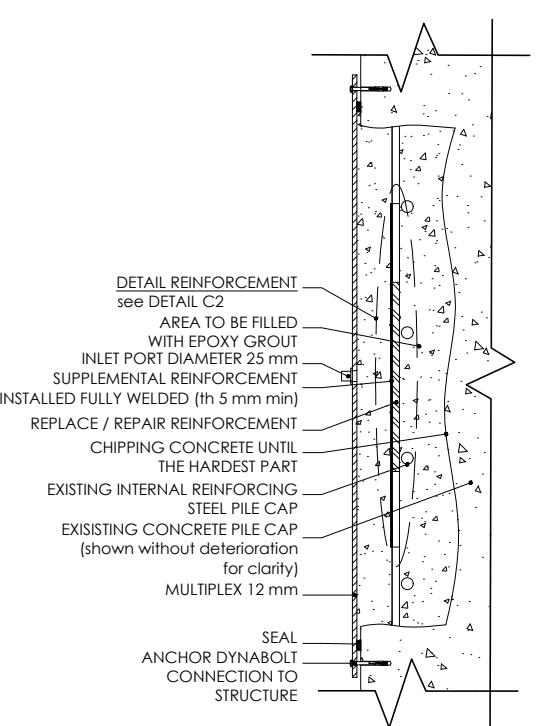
DETAIL - PATCHING METHOD & CONNECTION (A3)
